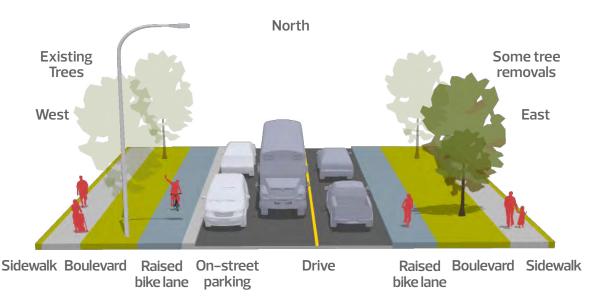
121 Street – 153 Avenue to 161 Avenue – Cross section
